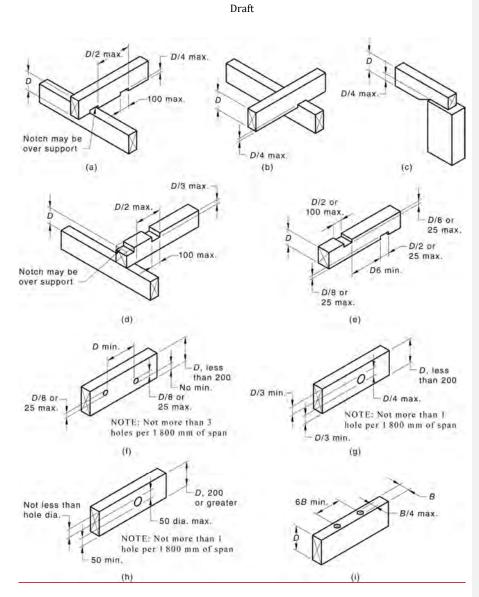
(B) — Notches, cuts and holes in beams, bearers, joists, rafters
